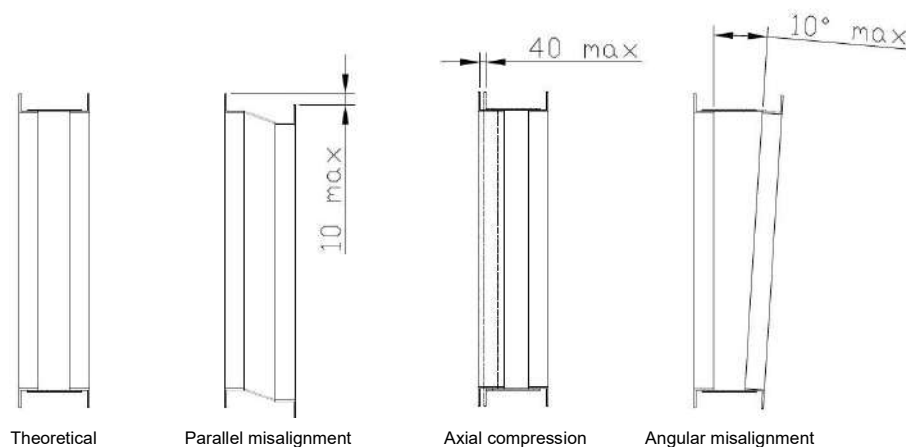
Assembly tolerances for flexible joints
